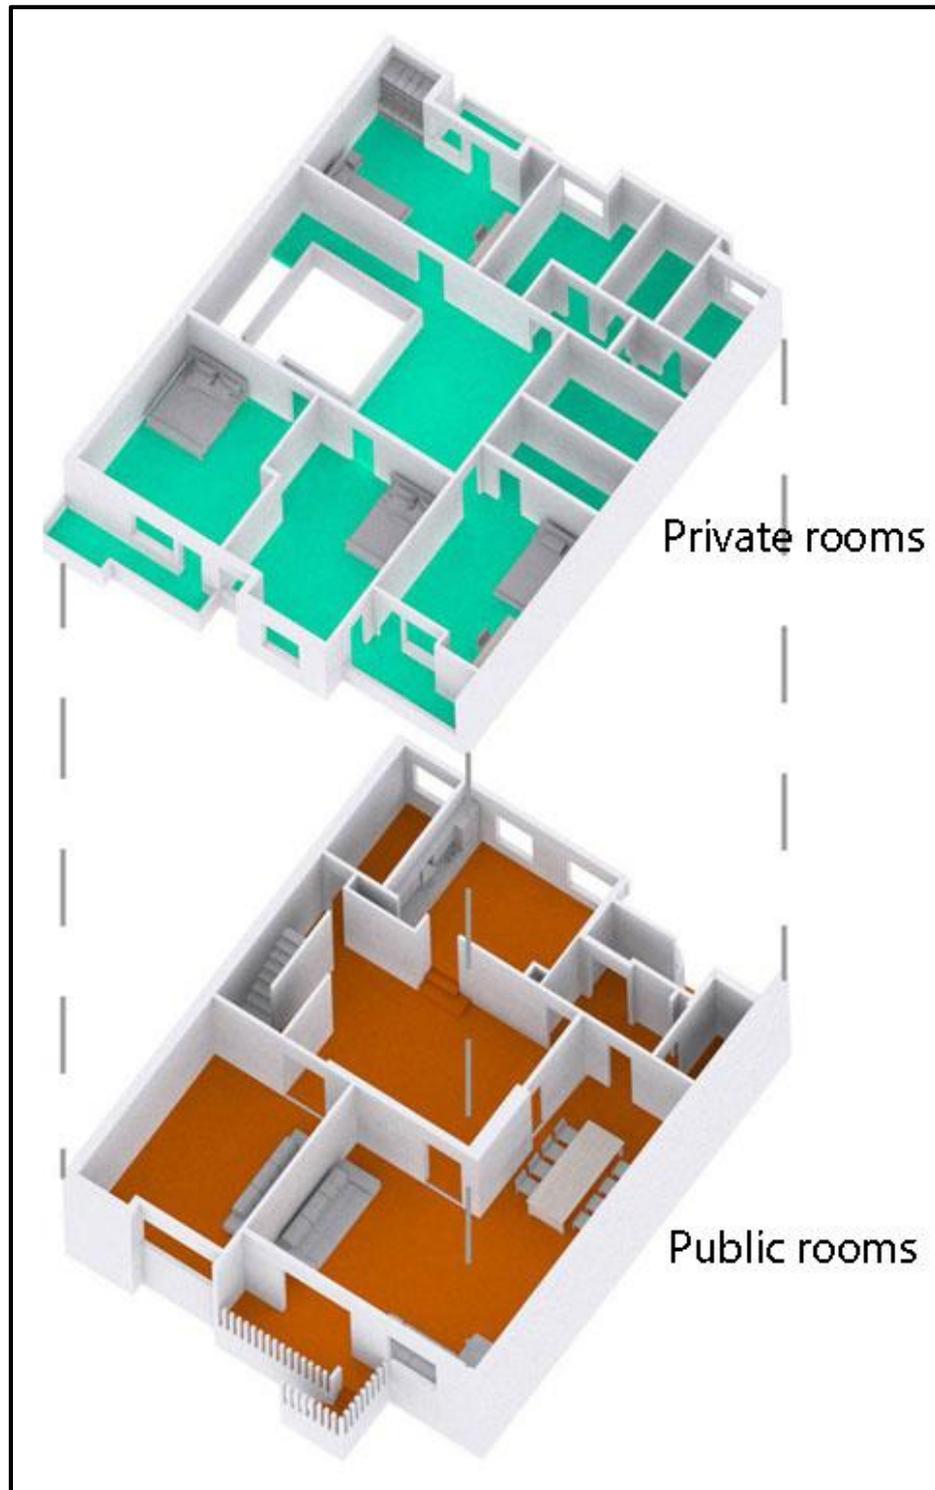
In the two storey houses, the separation of the public area from the private area occurs through locating them in two different floors; generally public spaces located at ground floor and private rooms at upper floor. source: (author, 2017)
